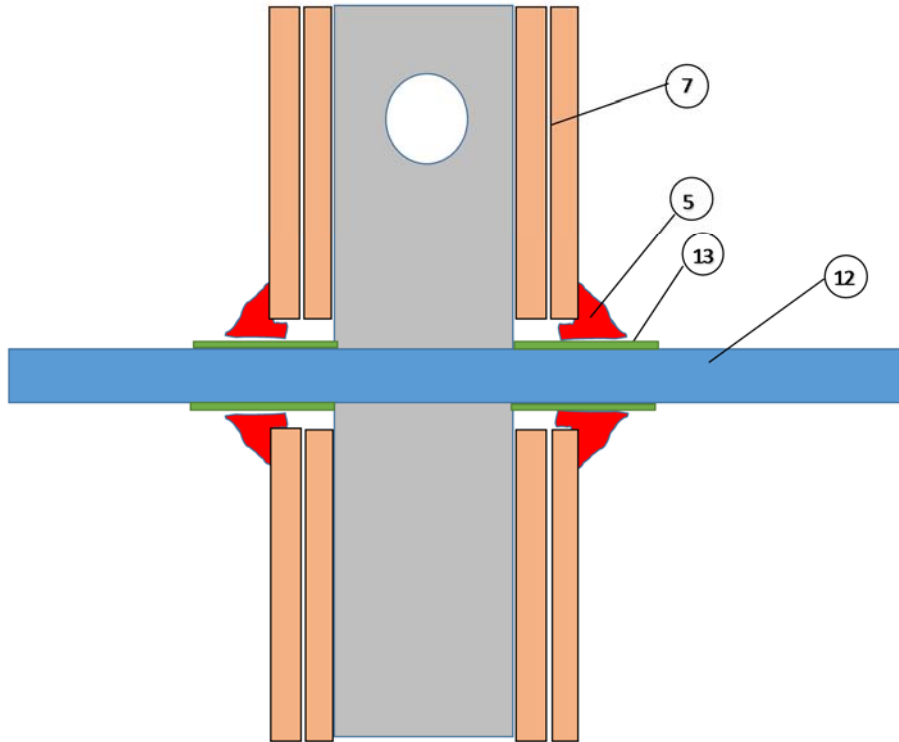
Typical detail for wrapped conduits for plasterboard lined walls
